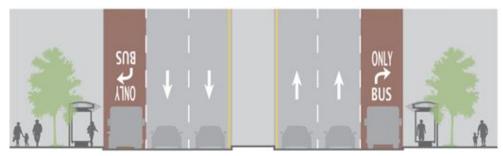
| Alternative 5 Cross-section of Spring Hill Road from International Drive to Route 7
